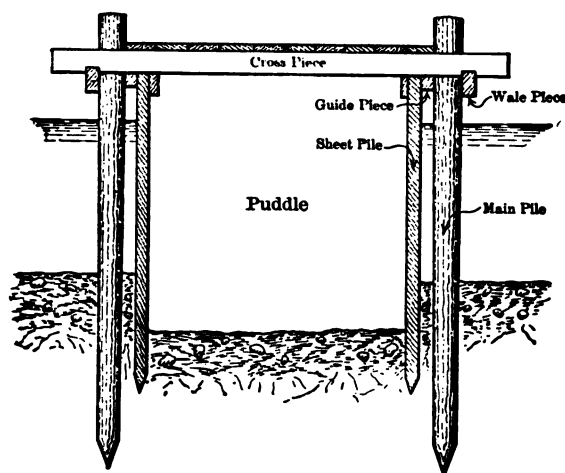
DOUBLE SHEET-PILE COFFER-DAM.
